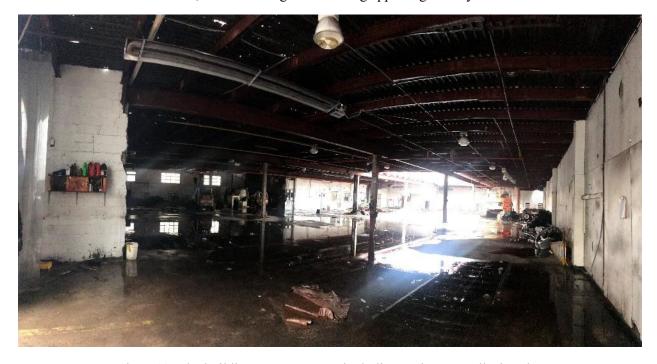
The building superstructure including perimeter walls, interior columns, and remaining steel framing appears generally intact..
